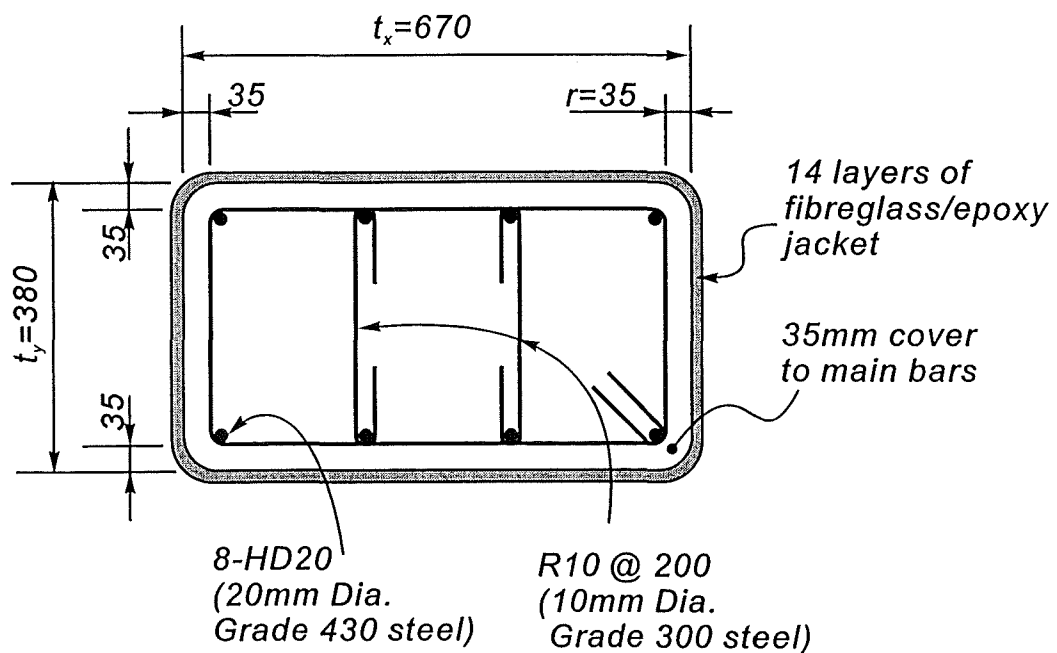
General Reinforcing Details of 670 mm by 380 mm Column
